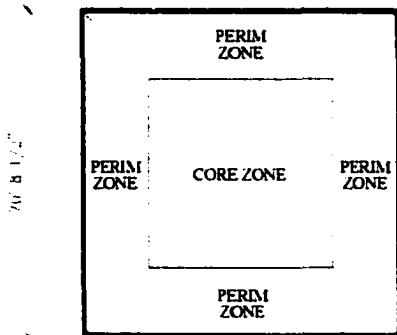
Plan view of the Minimum Compliance Case building with typical zone configuration
